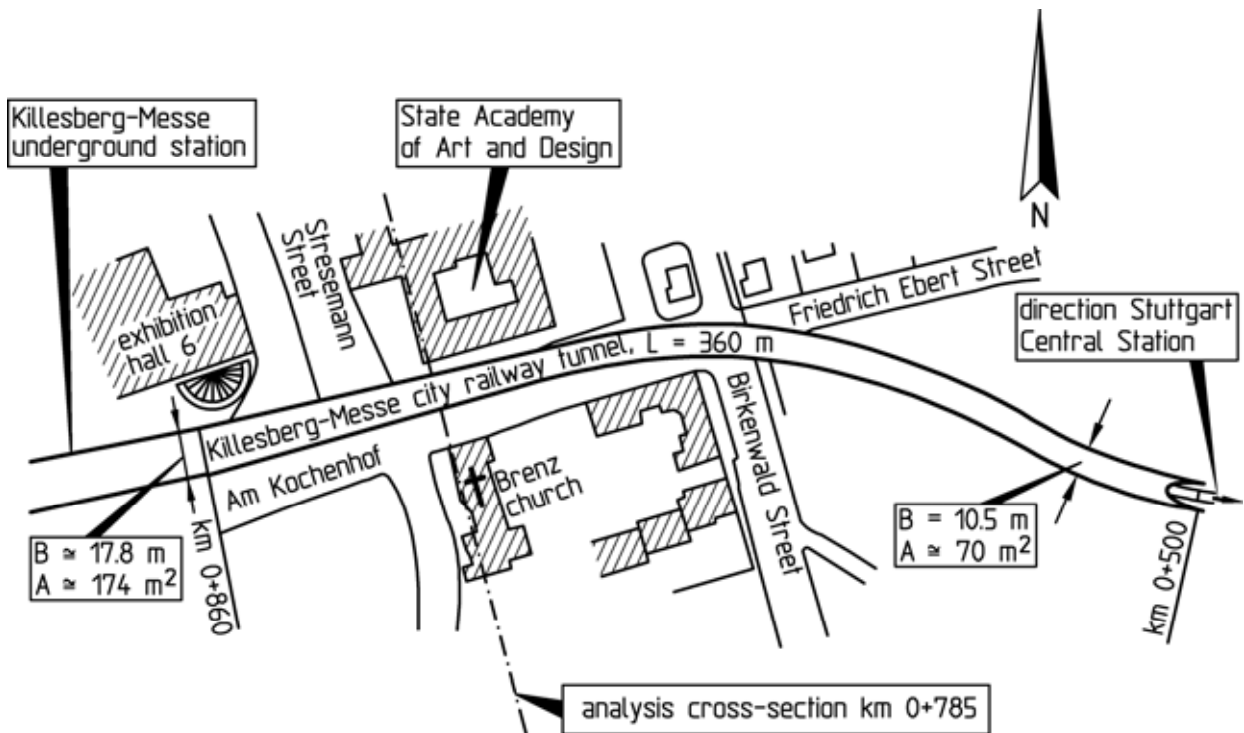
Killesberg-Messe city railway tunnel, site plan
